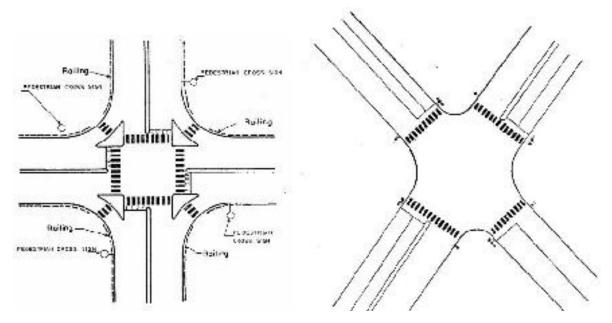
(Left) Zebra Crossing arrangement for four armed channelized section (Right) and at four arm intersection
